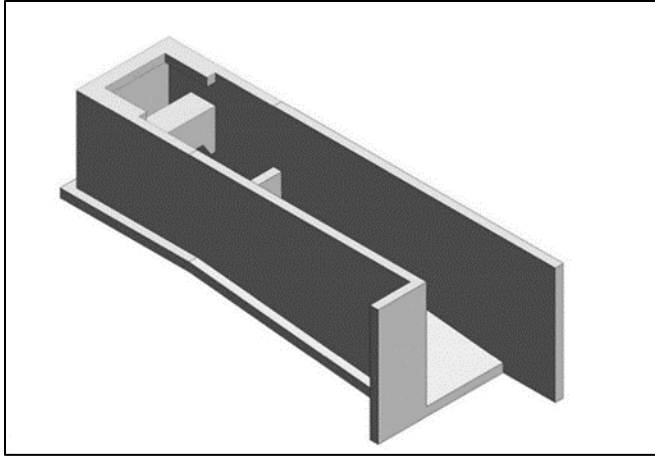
Pasco Pump Lateral baffled outlet and flume design.
